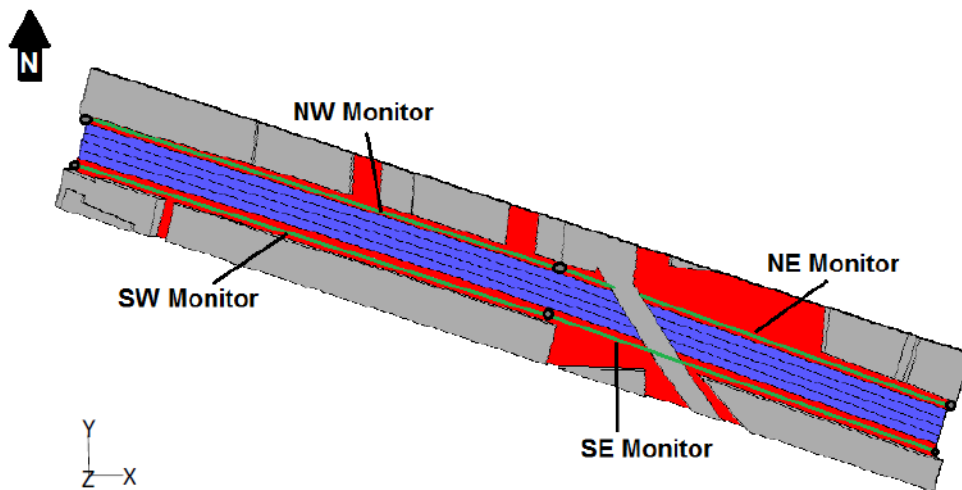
Plan view of Pearse Street model with footpath monitoring locations
